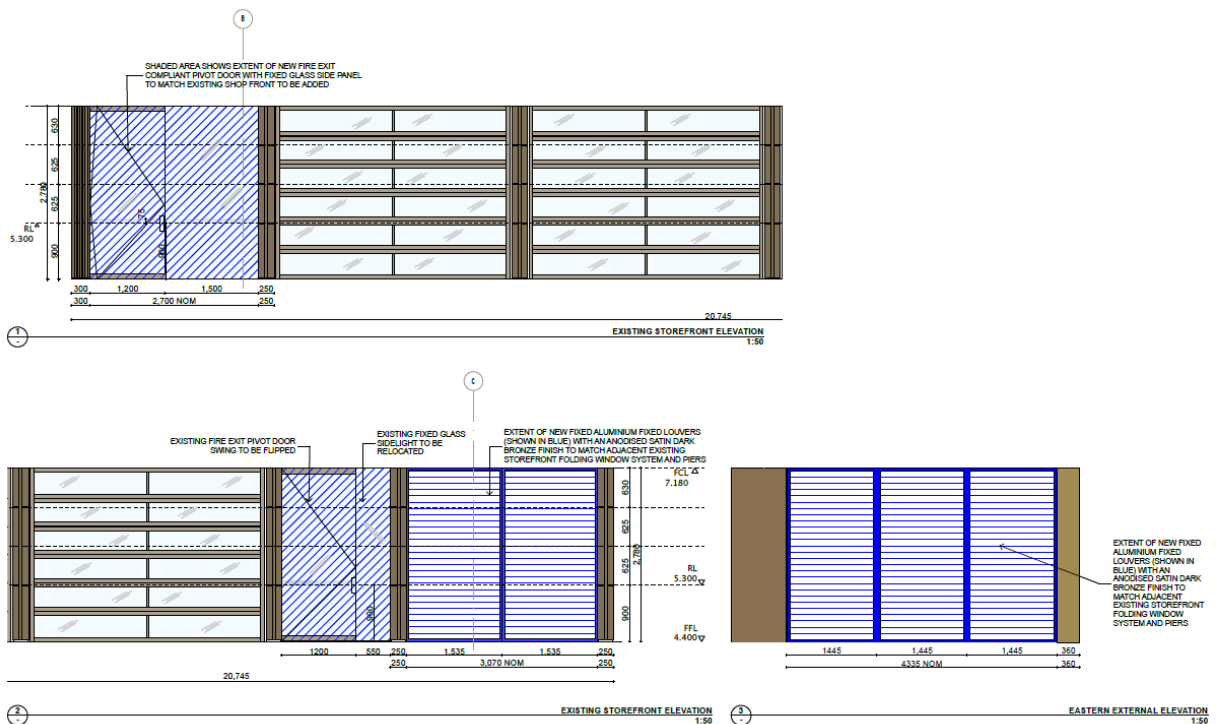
South and eastern elevation showing installation of a new fire door, flipped fire door and new proposed fixed louvres to the gaming room
